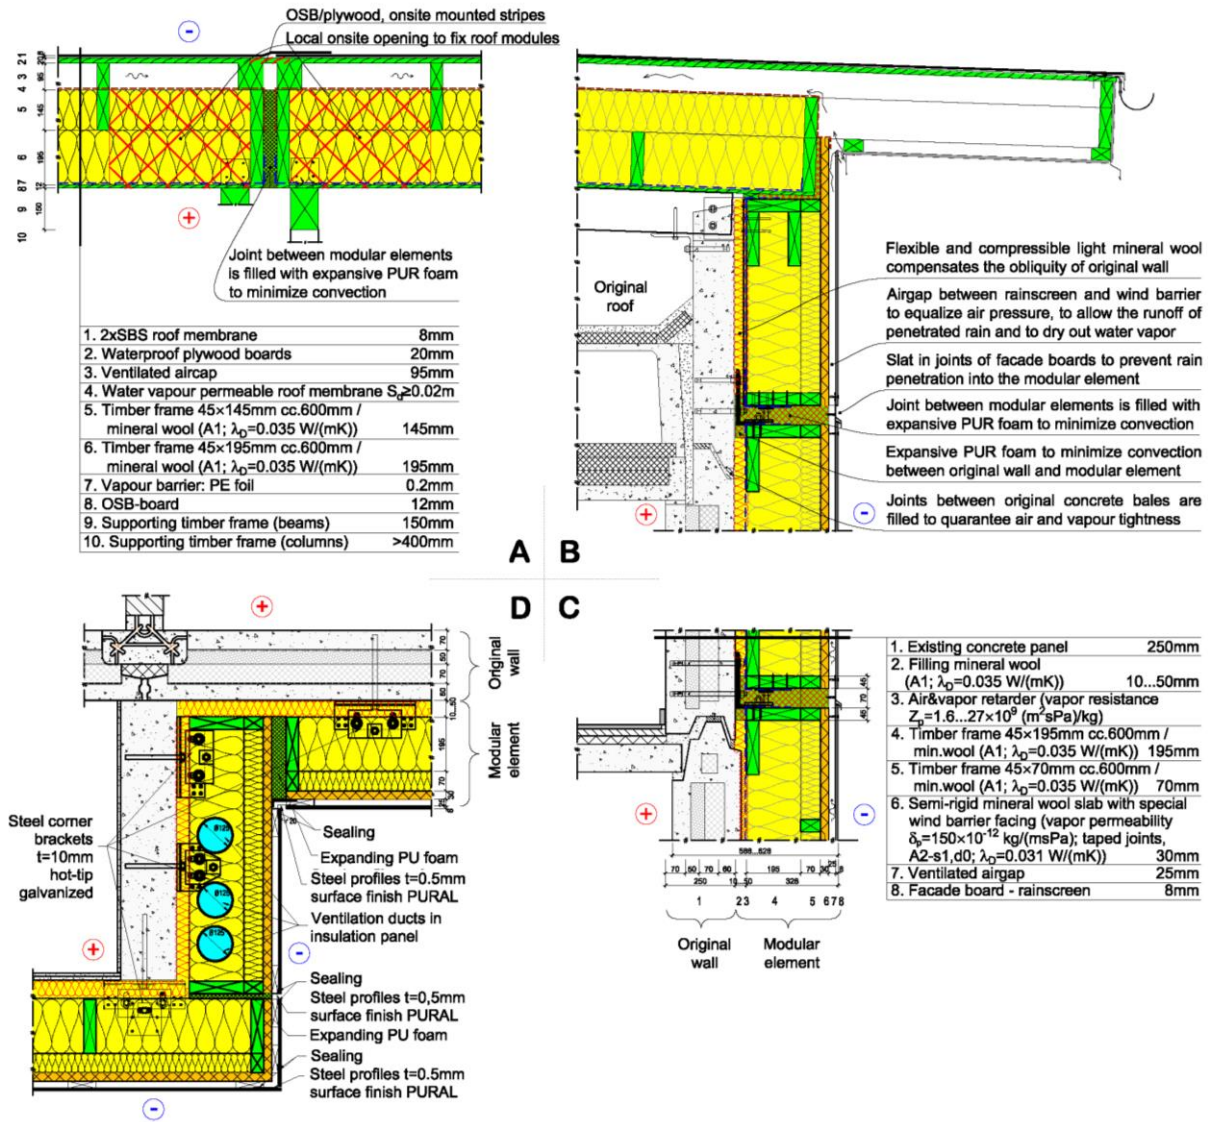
Designed solutions of the wall and roof modules of the pilot building
